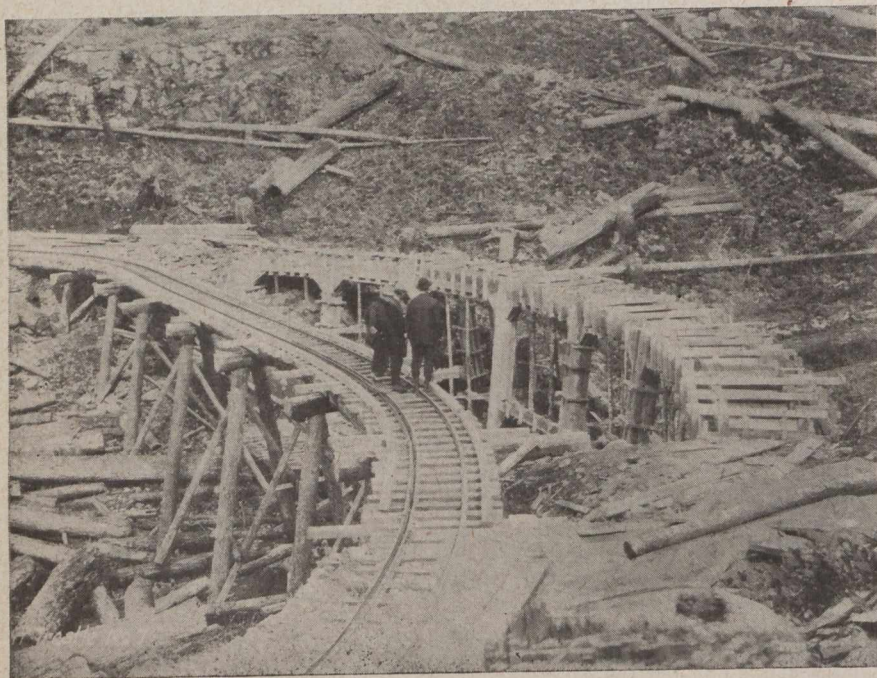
View Showing Timber Trestle of Construction Railway and Concrete Trestle for the Pipe Line.
